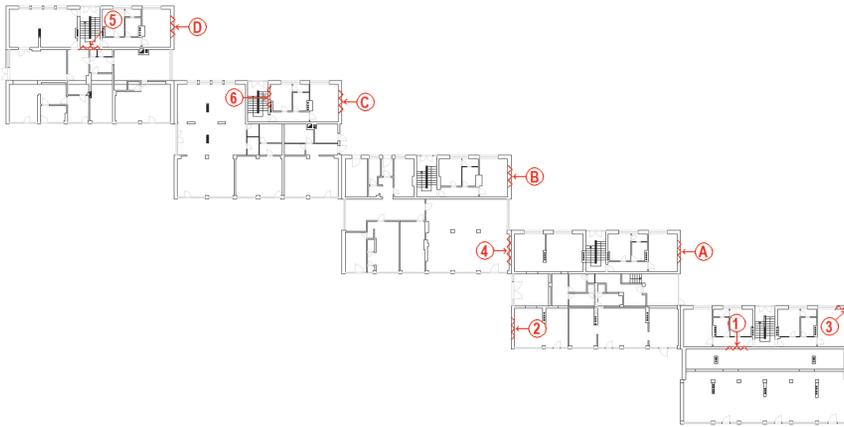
Ground floor plan – positions (POS) of damage shown (POS A to POS D)
